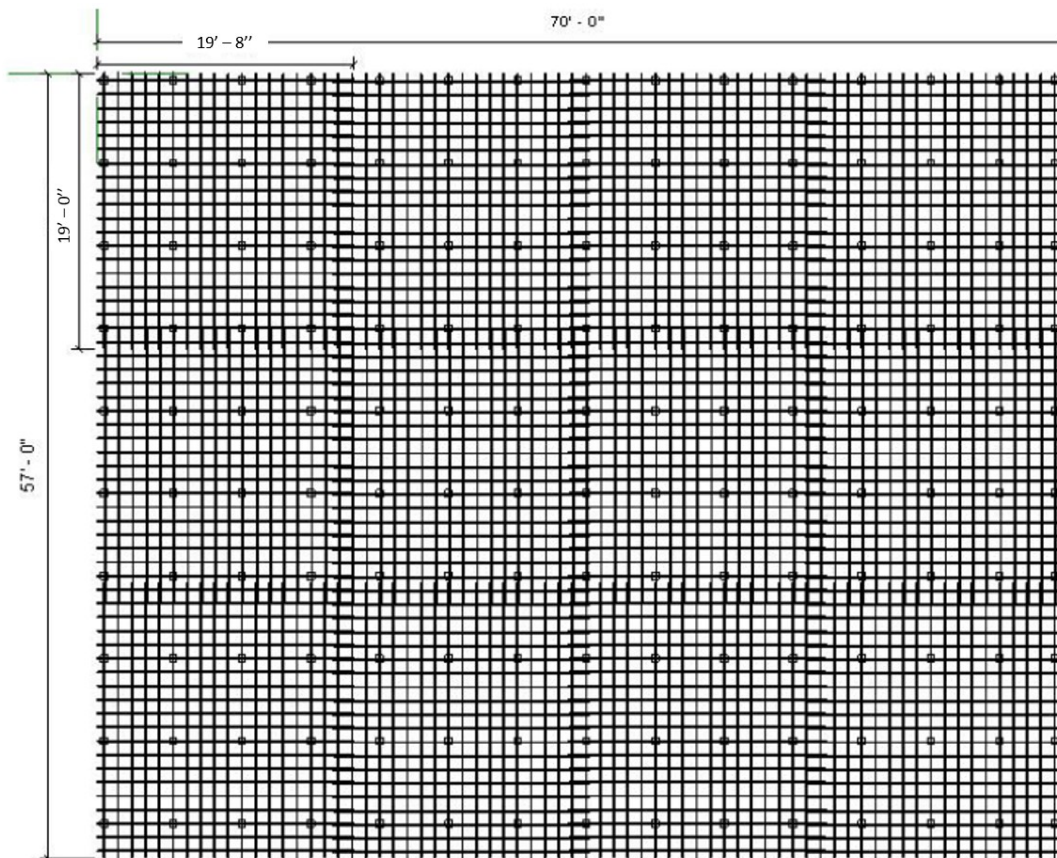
Rebar Layout Arrangement Plan (Lu 2017)
